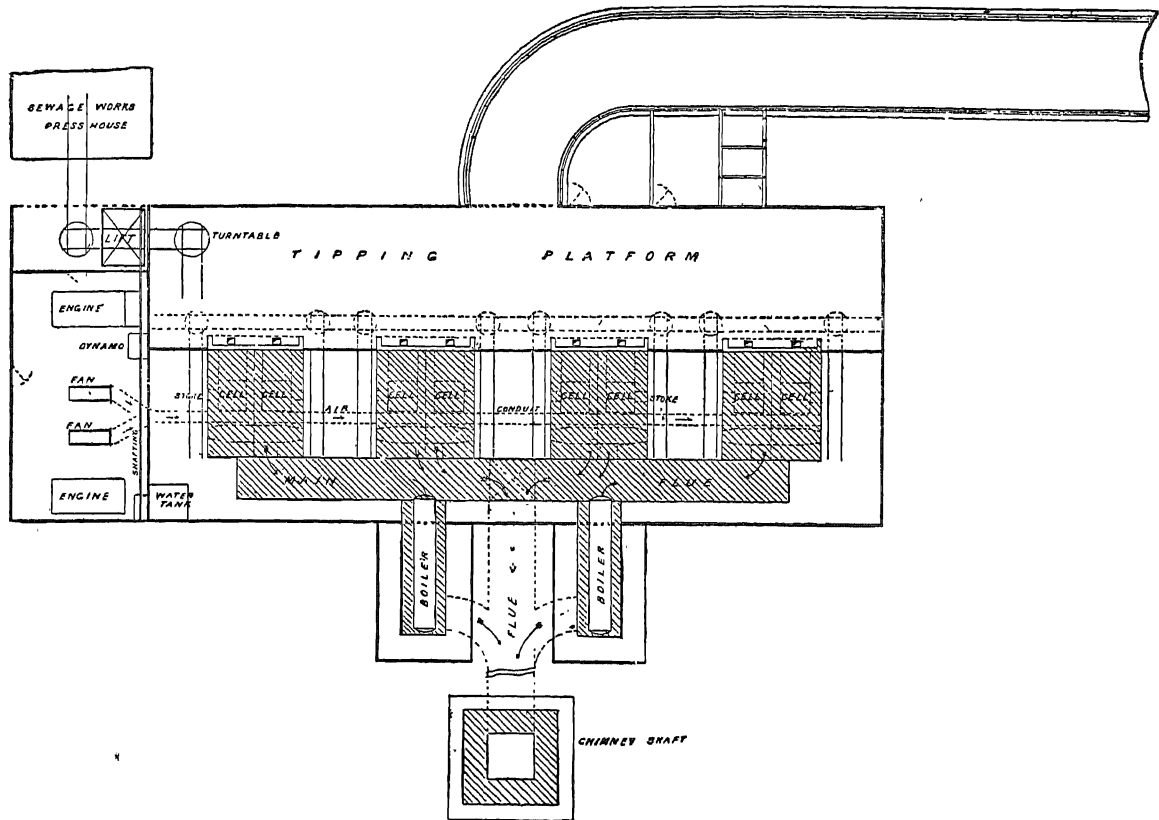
Leyton Destructor—Block Plan, showing general arrangement of the works
